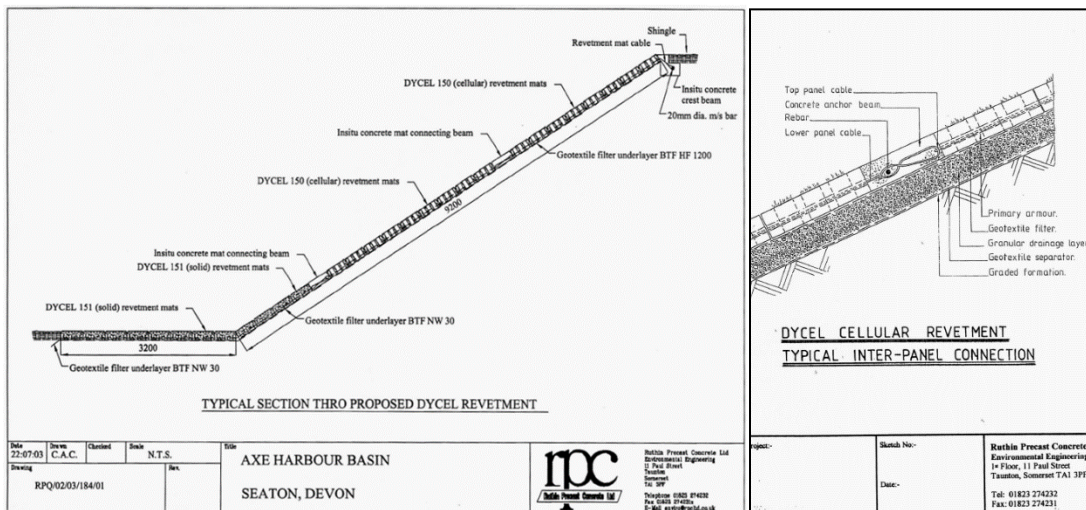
Typical Section through Proposed Dycel Revetment and Typical Inter-Panel Connection
